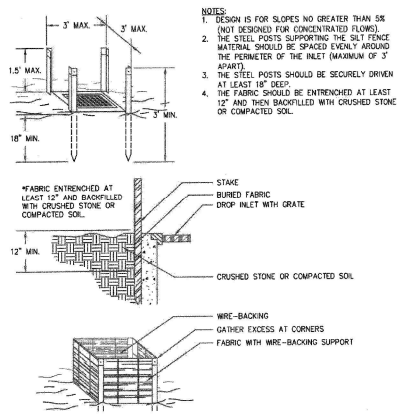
Fabric and Supporting Frame for Inlet Projection
